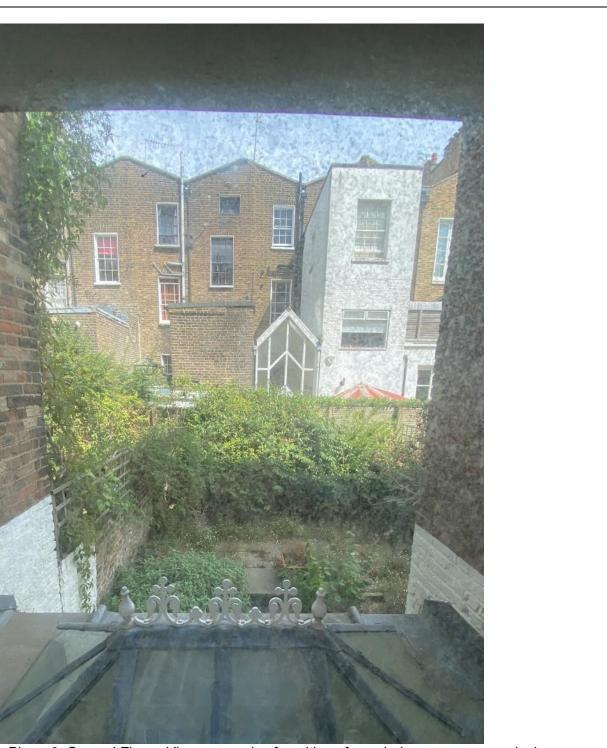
Ground Floor - View outwards of position of new balcony left (north) towards the garden of no.22. Page 146
